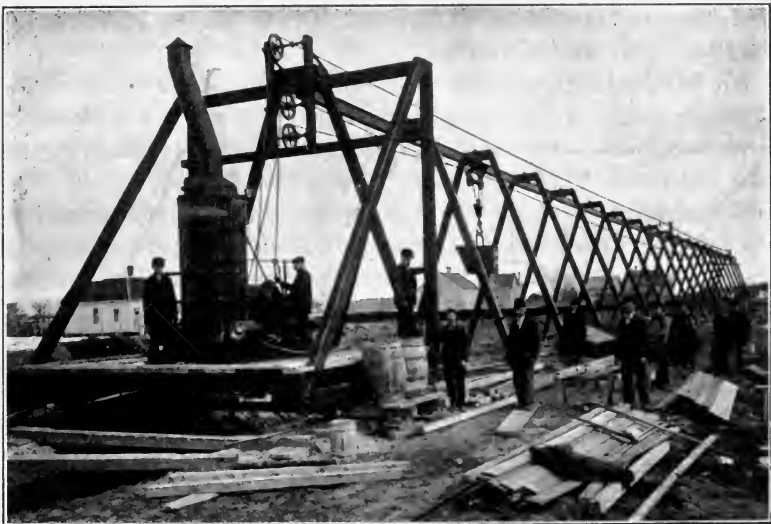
Trestle cable excavator operating in sewer trench construction.
